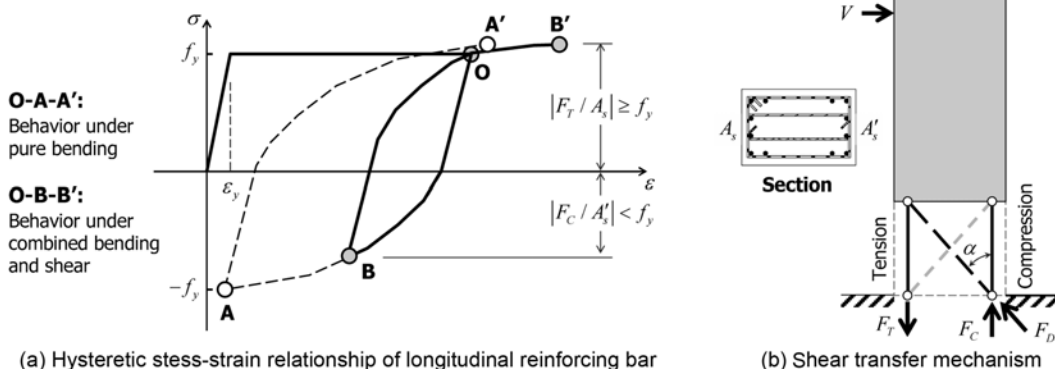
Mechanism of longitudinal elongation of reinforced concrete members subjected to cyclic loading (reprinted from reference 9)
